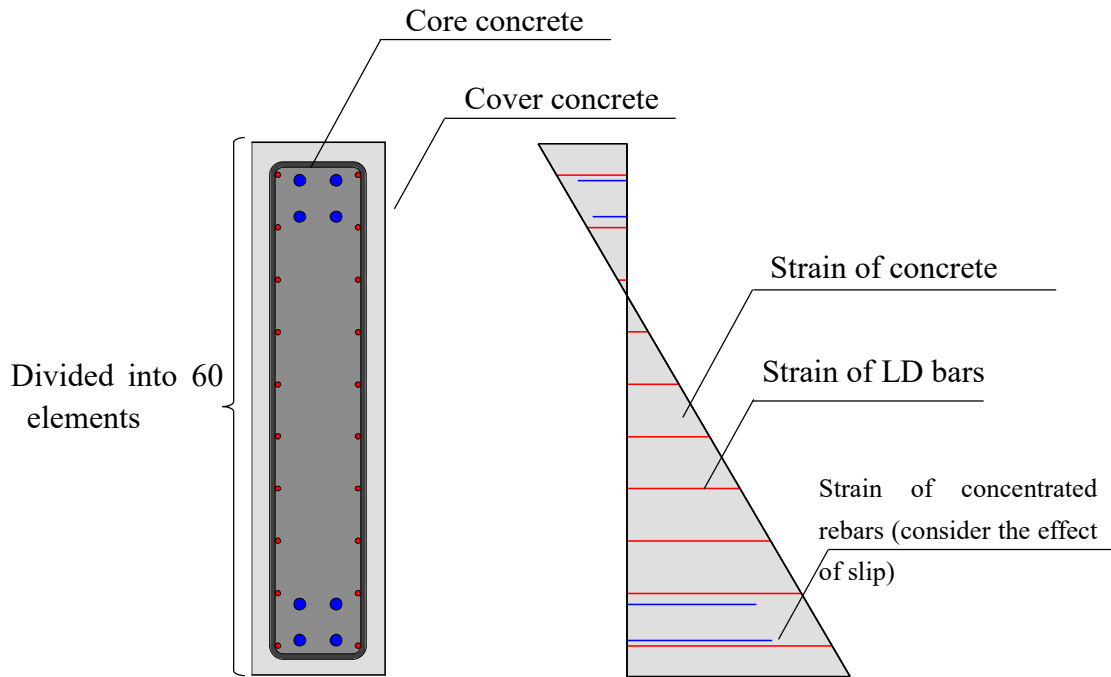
Section discretion and strain profile in wall panel cross section
